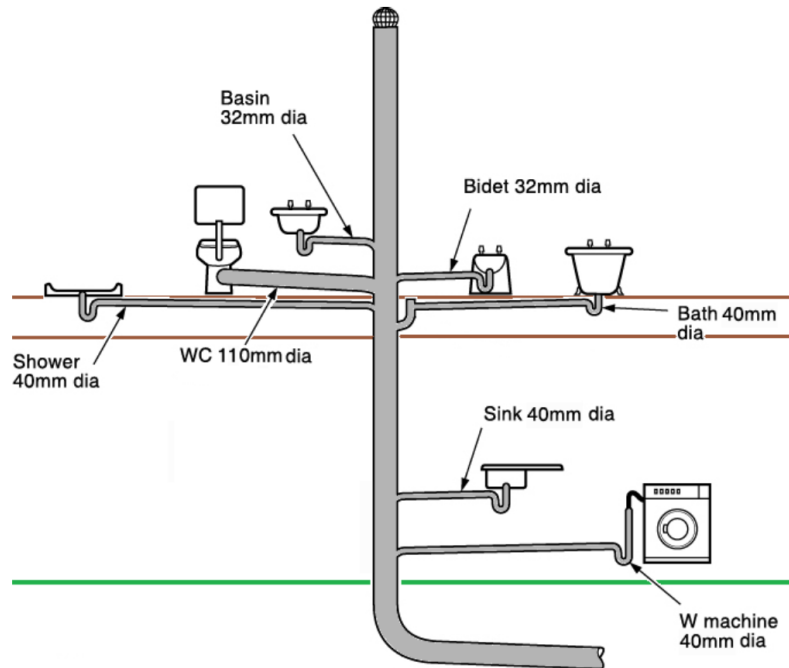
Layout of the water drainage architecture in a conventional residential building [20]
